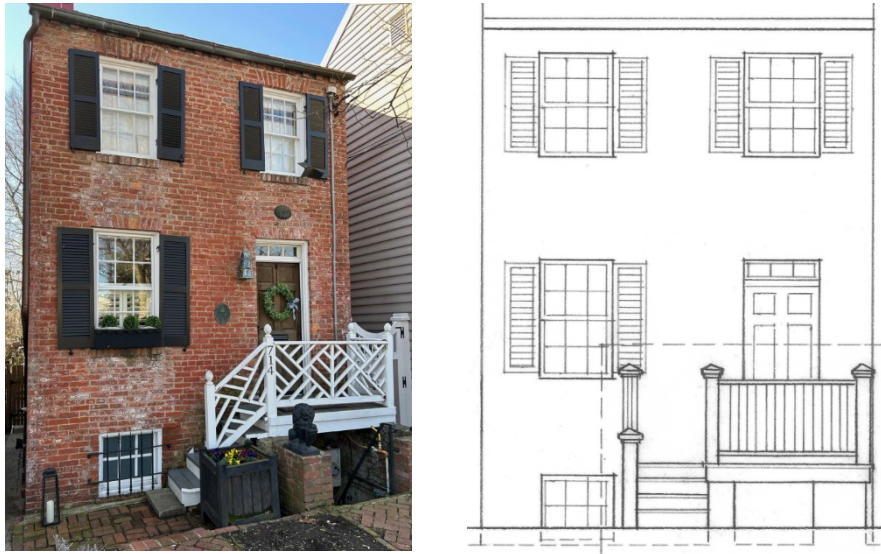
Photo of existing stoop (left) and drawing of proposed stoop (right).
